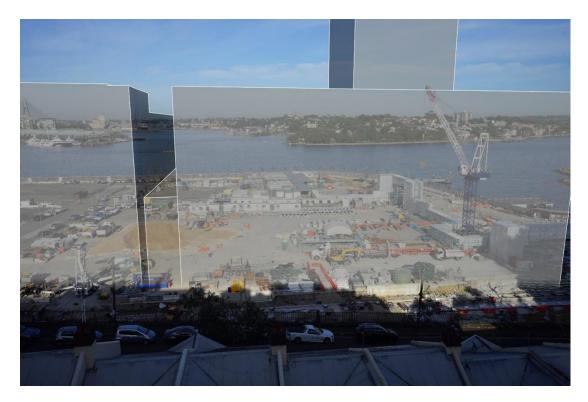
Proposed Building Envelope. Level 3 of The Langham Hotel, facing west (Source: Digital Line).
